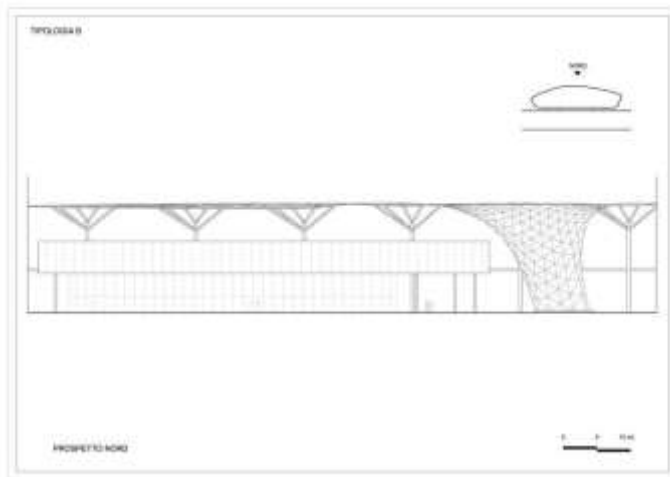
a New Trade Fair Milan – Milano Fiera
